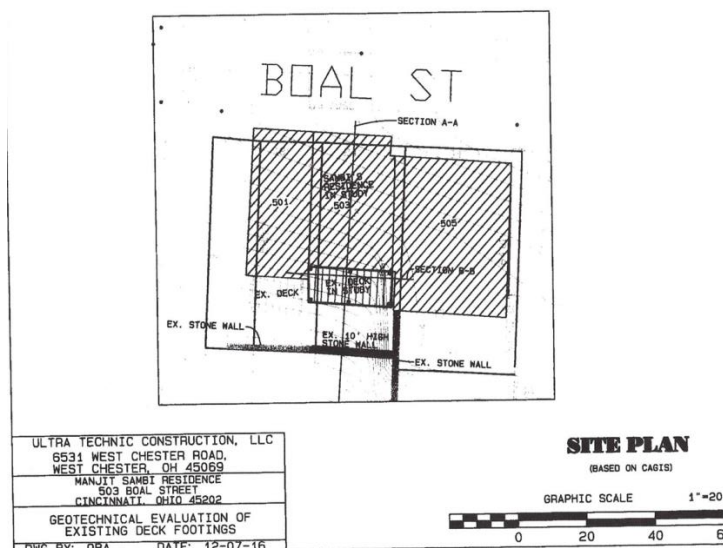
Site Plan showing 503 Boal Street. The deck is a similar size to the deck on 501 Boal Street and the neighboring property at 505 Boal Street has a deeper lot and a bigger building.
